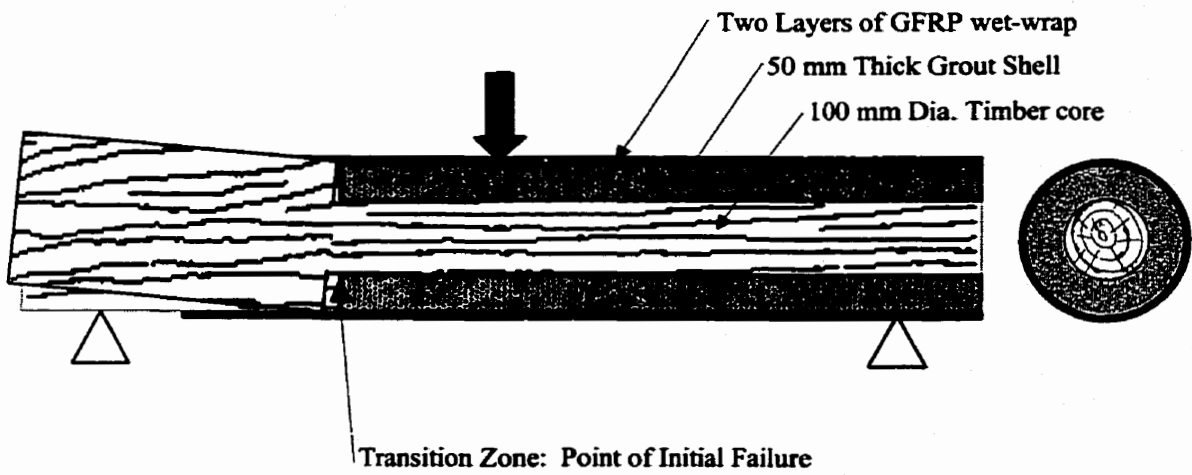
(b): Schematic of Longitudinal Cross-Section of Repair Specimen at Failure
